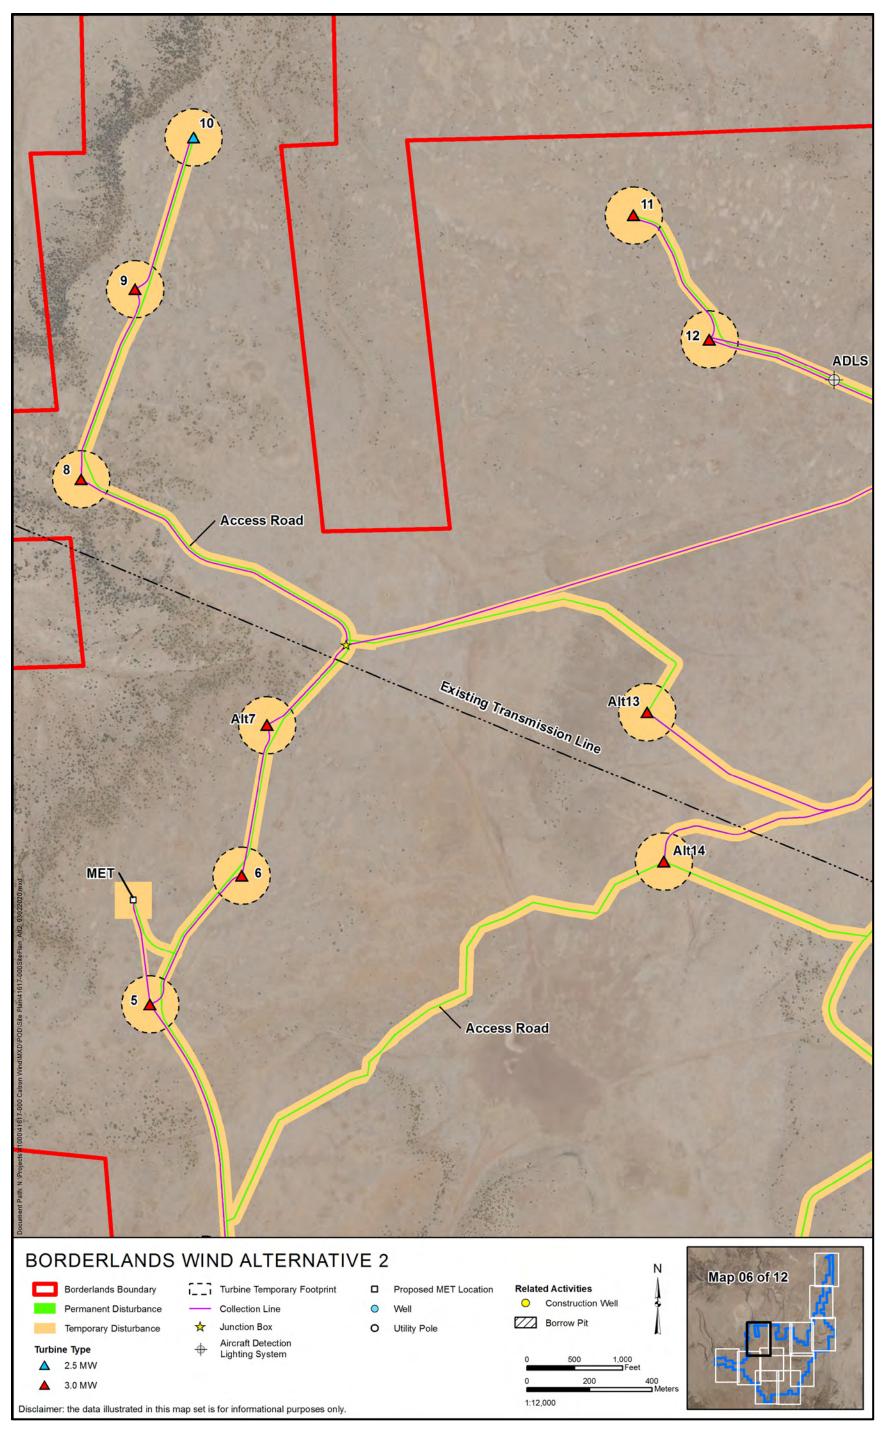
Alternative 2 Site Plan (Map 6 of 12)
